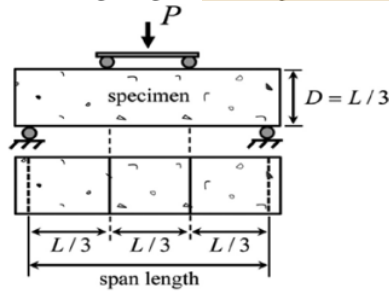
Flexural Bending Test (Four-point bend test ASTM C-78)^[24]
